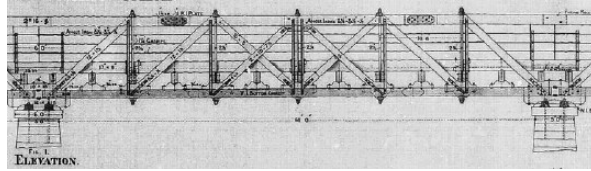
Plan of the Bridge over Derwent River at Plenty, Tasmania built 1892 (Tasmanian Archives Office).
